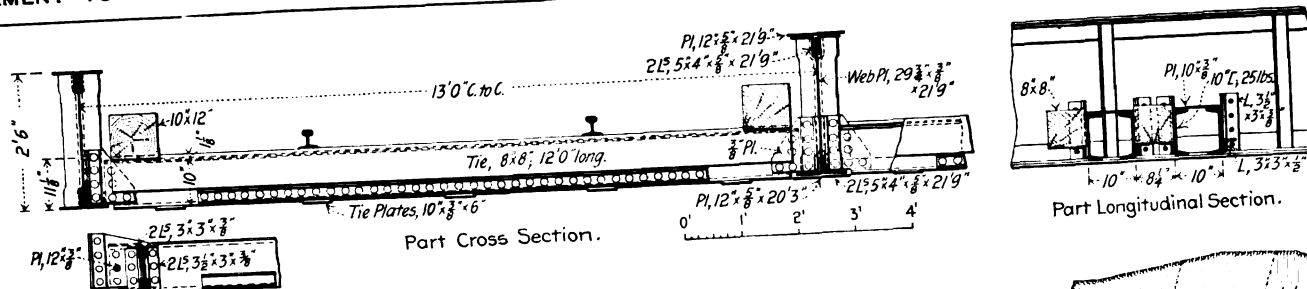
STANDARD FLOOR FOR SHORT SPAN BRIDGES.
